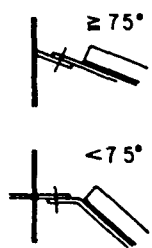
Limitation of distance between welding joint and column flange
